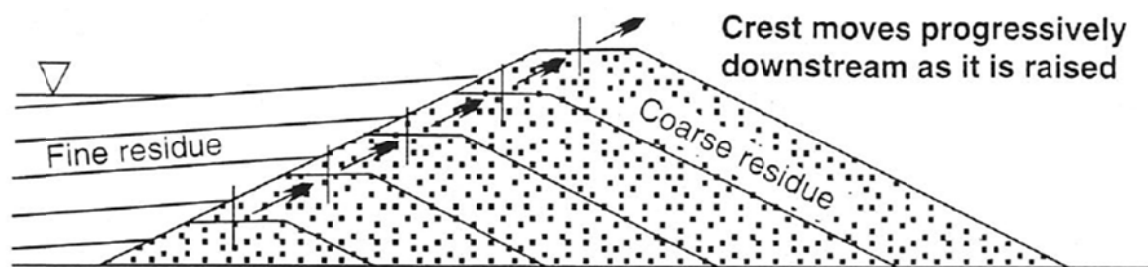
Section through a wall constructed downstream (CMSA, 1996)
